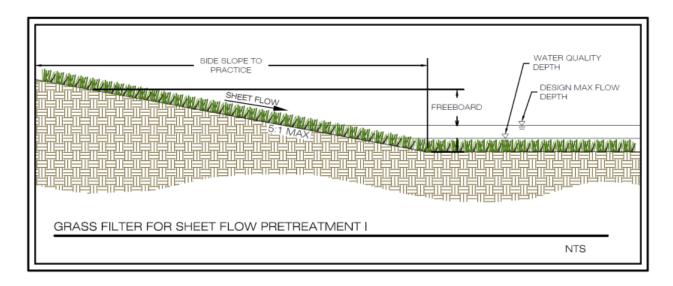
Typical Details for Level 1 and 2 Dry Swales
